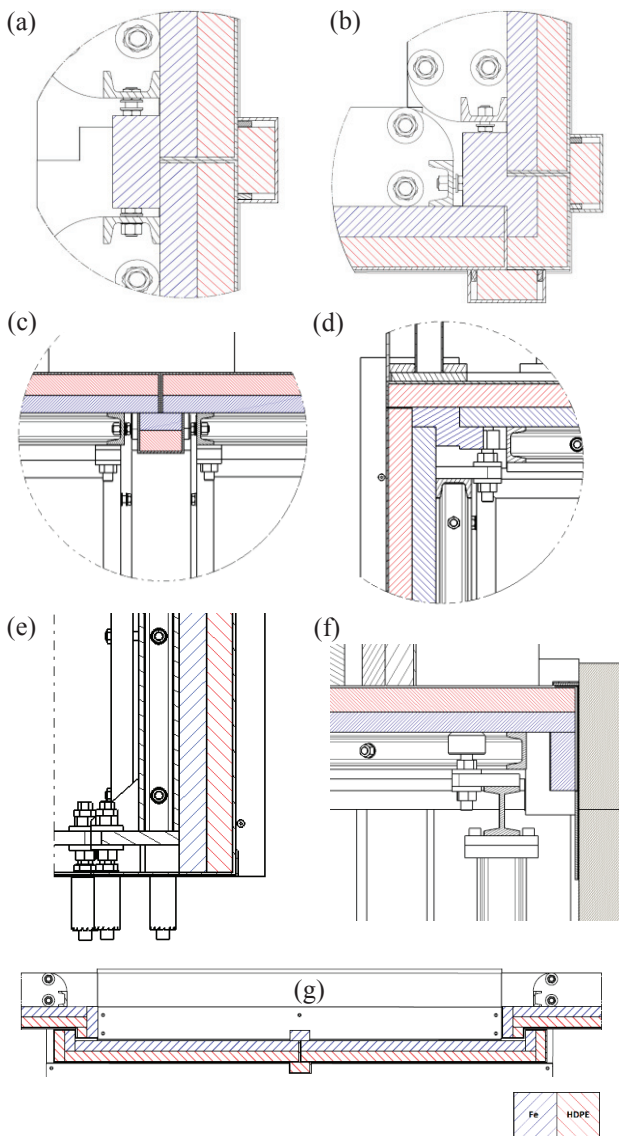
(a) Joint of 2 wall modules, (b) Corner of 2 wall modules, (c) Joint of roof modules, (d) Joint of wall and roof modules, (e) Floor fixation of wall module, (f) Roof interface to hatchet wall, (g) Double-sliding door.
